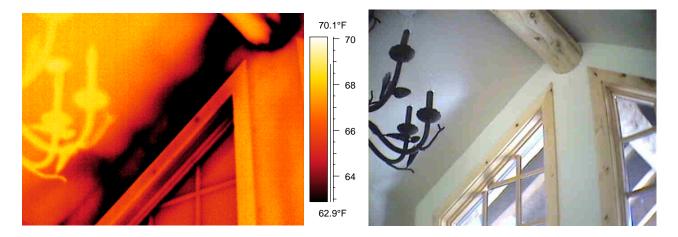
& 20. - Infrared cameras reveal substantial cooling during depressurization both around the ridge beam log and also at the sloped interface between the drywall and vaulted ceiling. Note that large openings existed between the log wall and roof soffit immediately opposite this image. These openings were permitting substantial air infiltration.
